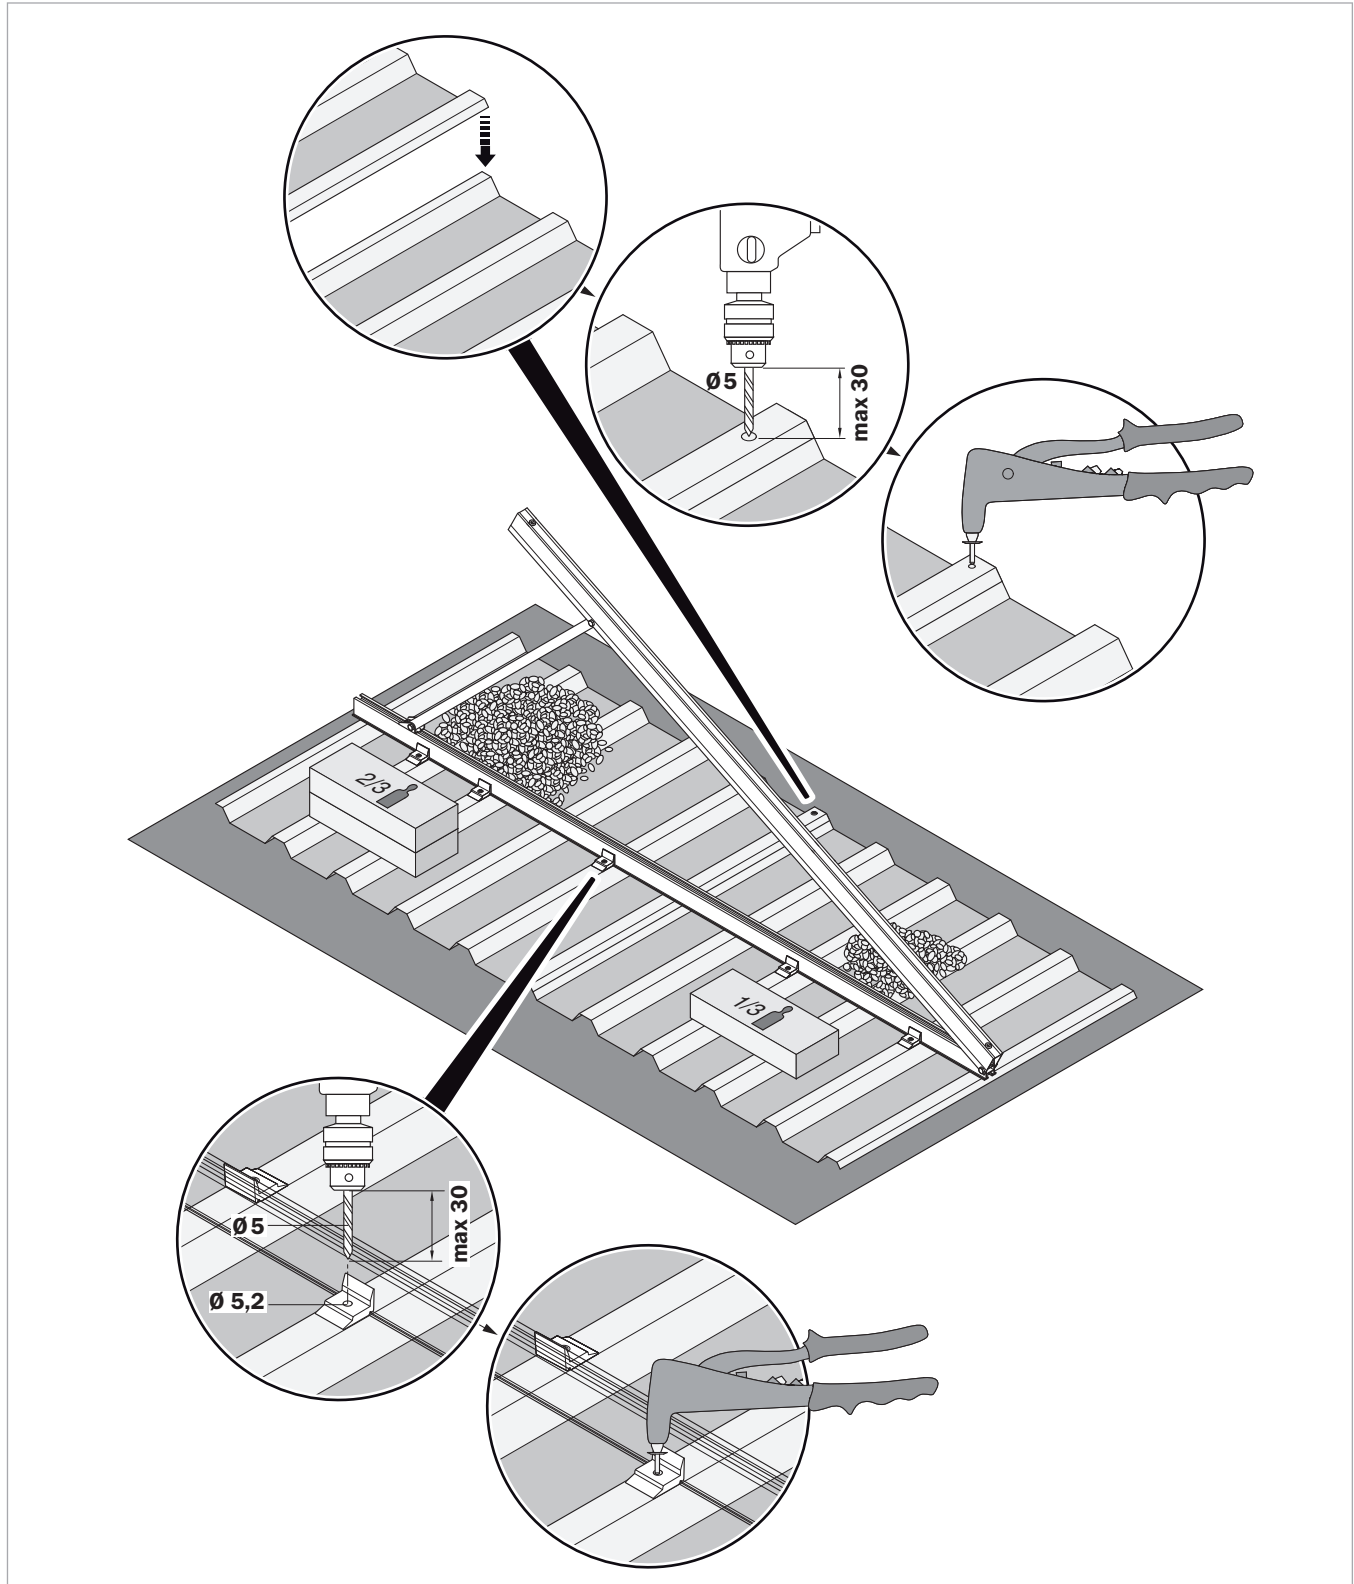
Flat roof holder installation on trapezoidal sheet metal, with trapezoidal sheet metal kit
